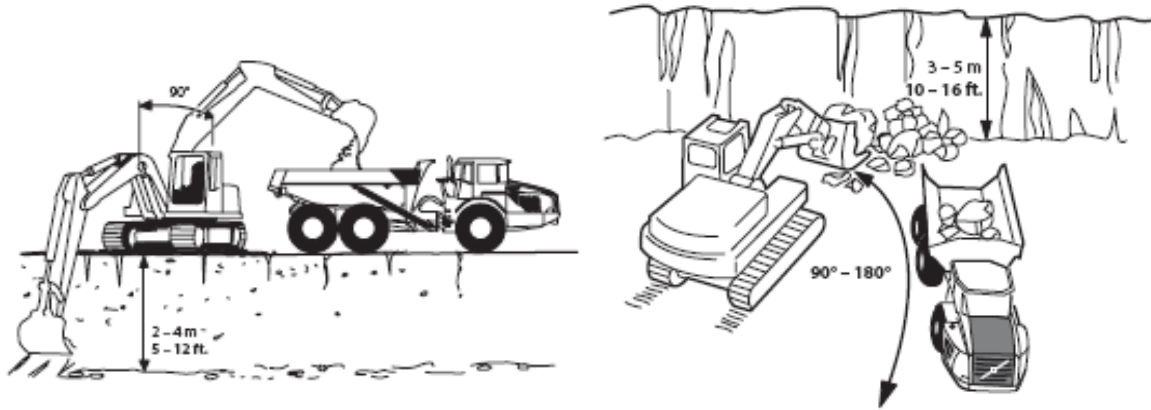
Excavating and loading with excavator, from Volvo GPPE performance manual (2009).
